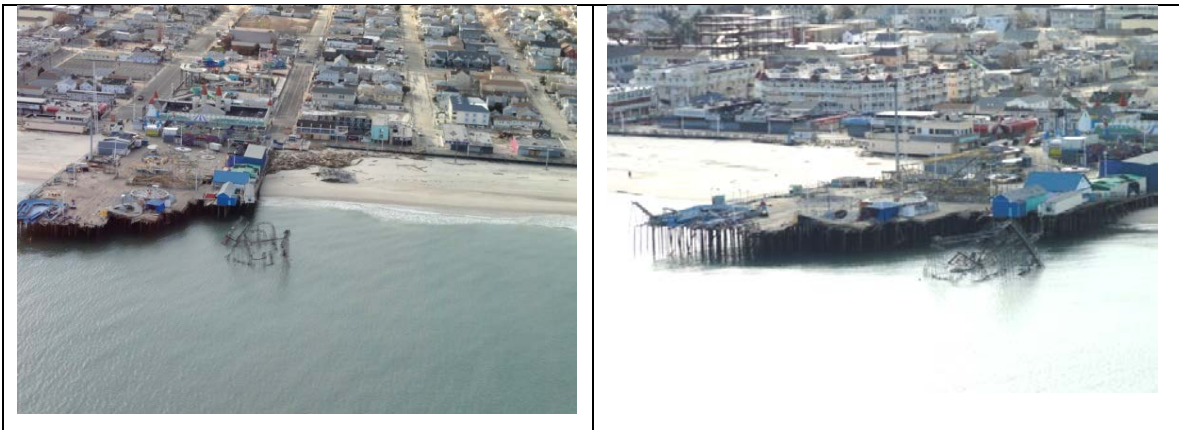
Damaged amusement pier with missing timber piles, 39°56'33.52"N, 74° 4'9.26"W (A. Brenner, 2012), Seaside Park. See also Piazza, G. (2013)
